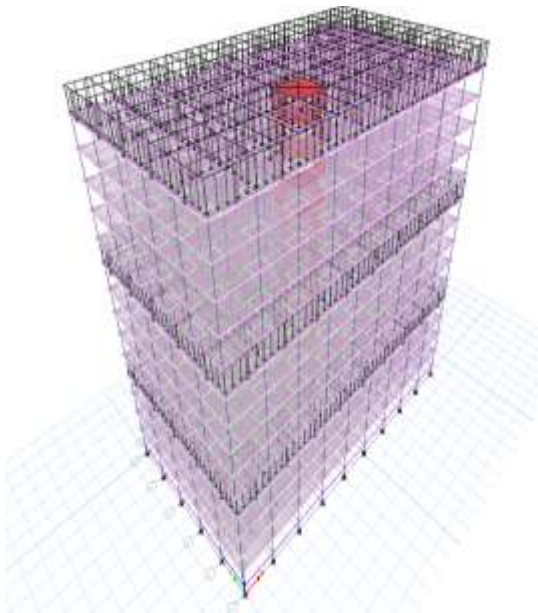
Irregular flat slab building with 200% mass irregularity at the 5th, 10th & 15th floor and shear wall at core
